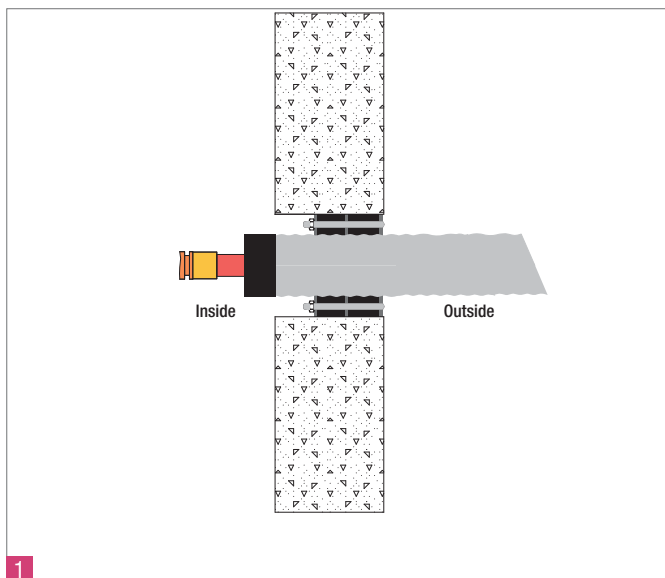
Compression wall seal FA 80, single, for water under pressure, side view
